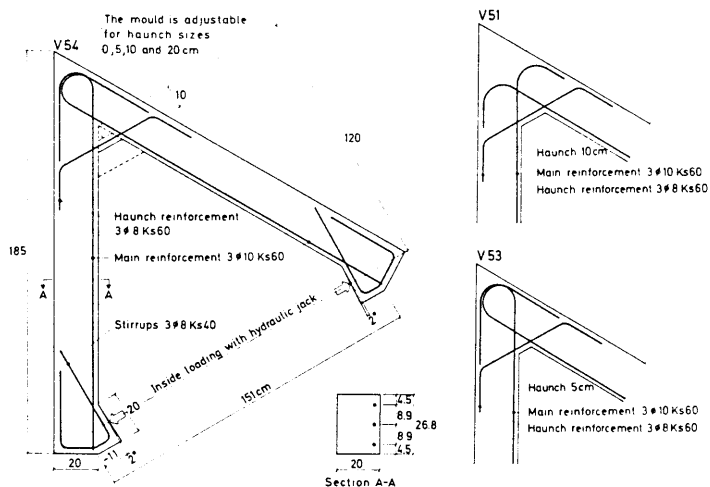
Reinforcement Details for 60° Corners—Dimensions and Method of Loading of Test Specimen (1 in. = 25.4 mm)
